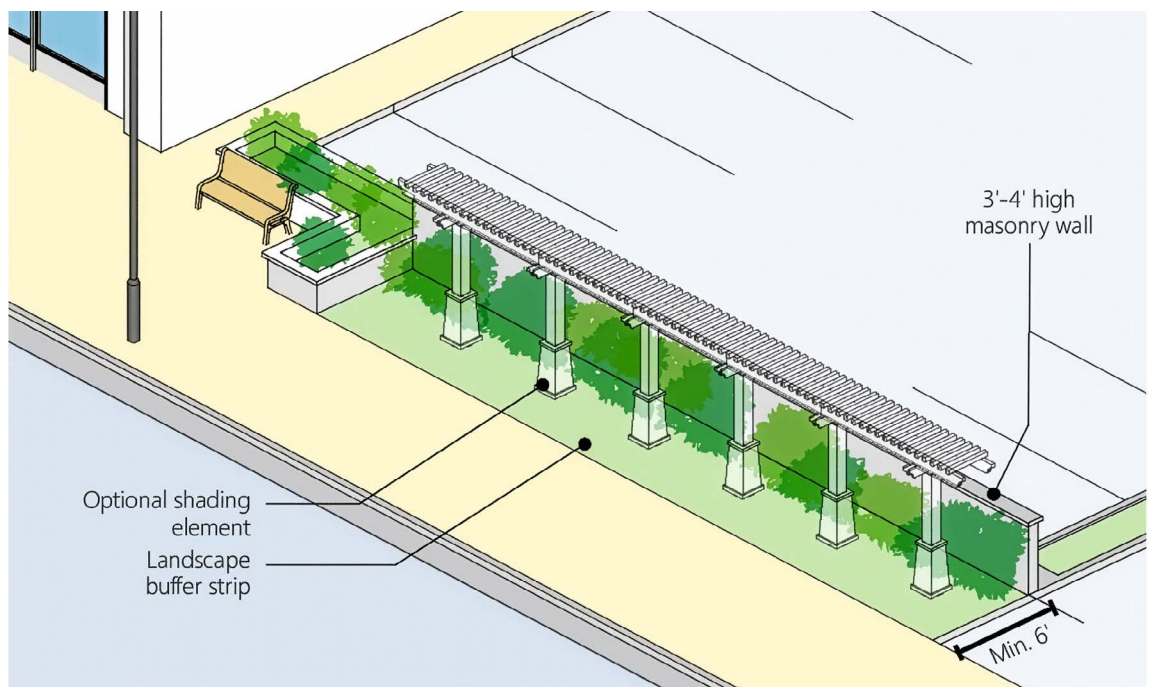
Surface parking areas shall be screened from sidewalks and public streets using a landscape buffer strip.
